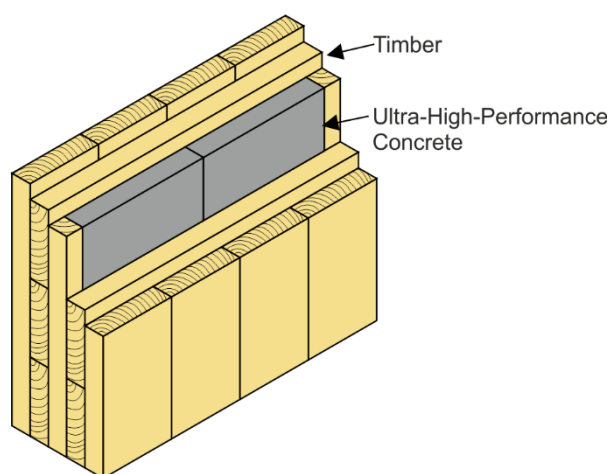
Wall element with glued in ultra-high performance concrete lamellas
